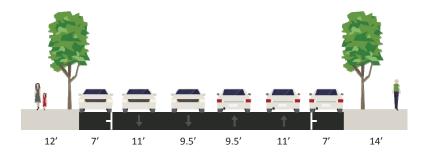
Morgan Street Typical Cross-Section, between Madison Street and Twiggs Street
